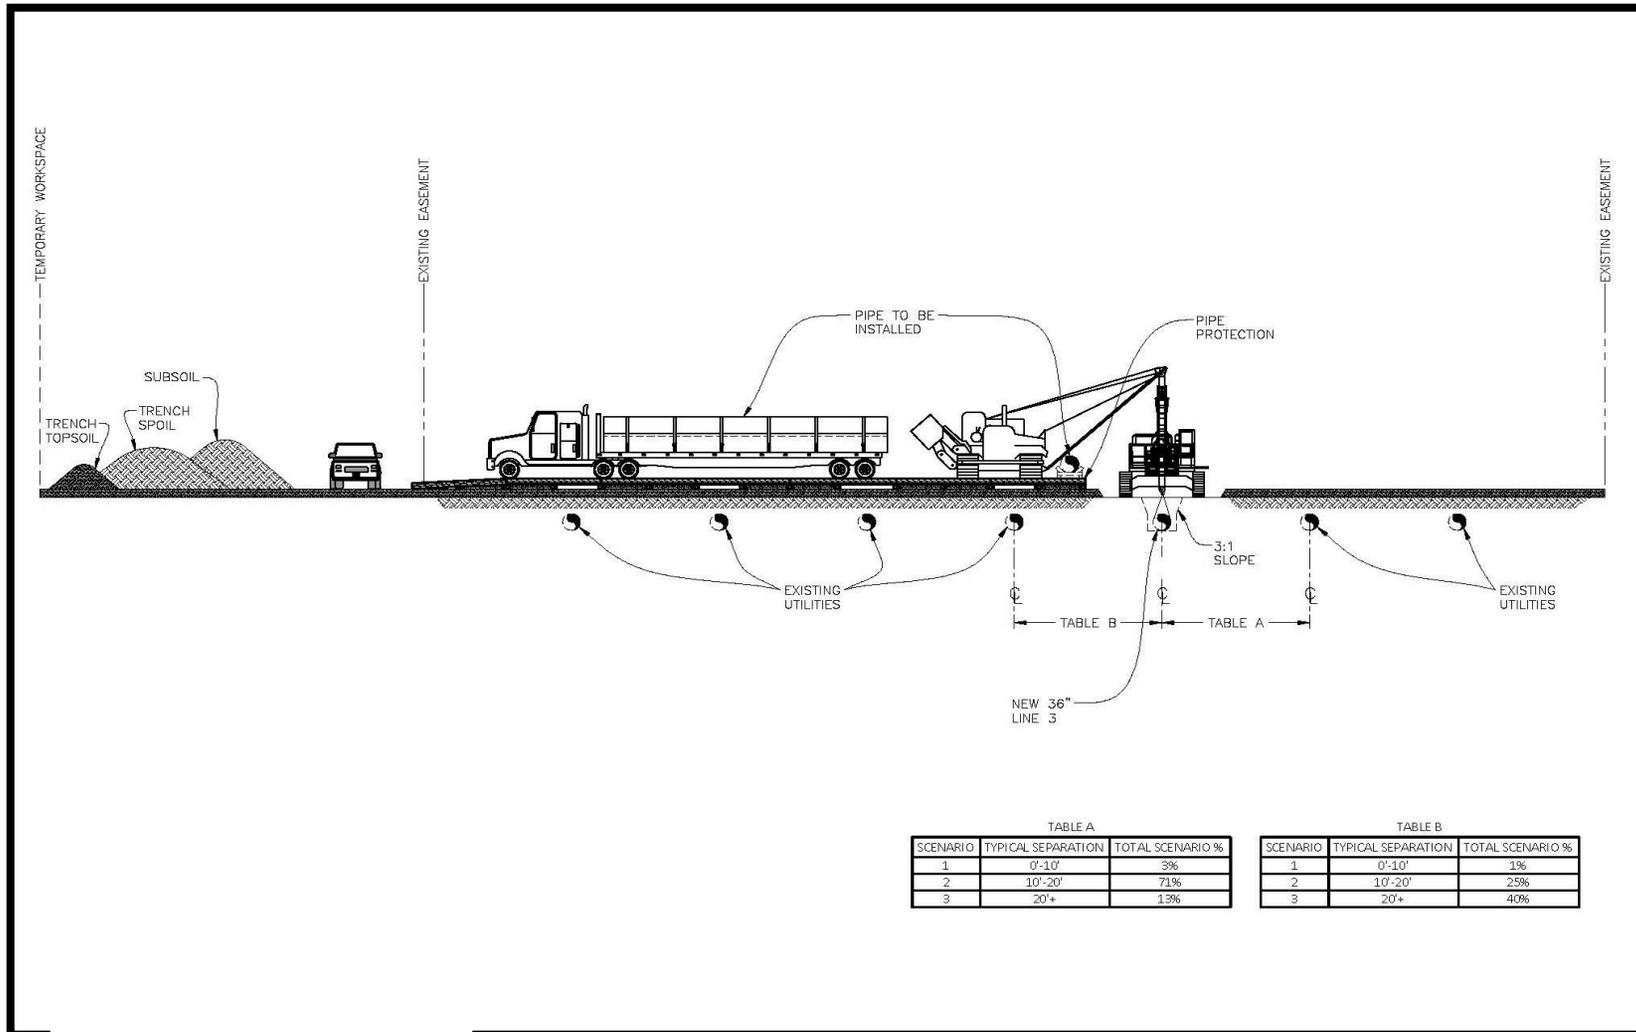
Typical Profile of the Construction Footprint for Same Trench Installation
